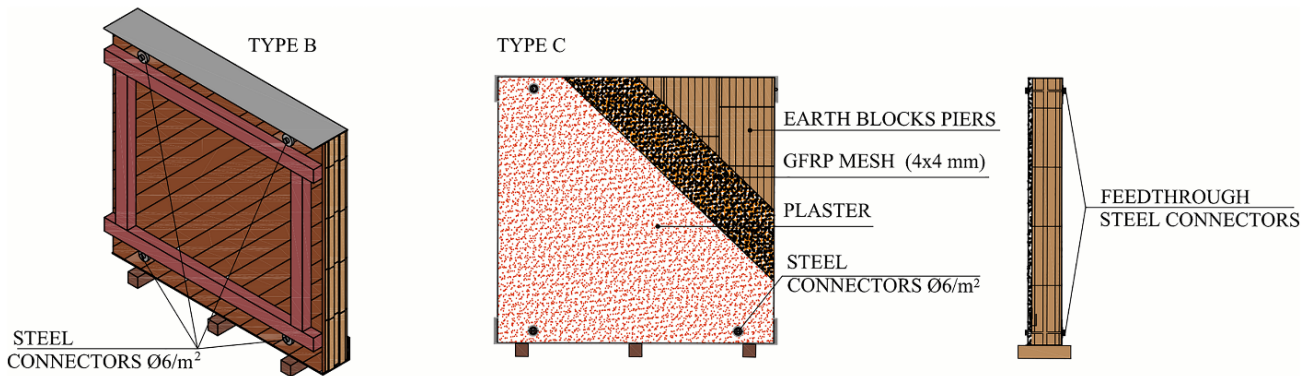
Details for fir boards and GFRP connections to earth blocks: type B and type C specimens.
